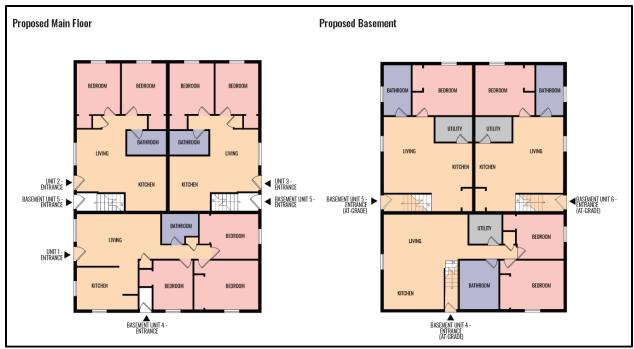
Floor Plan of the proposed 6-unit converted dwellings.
